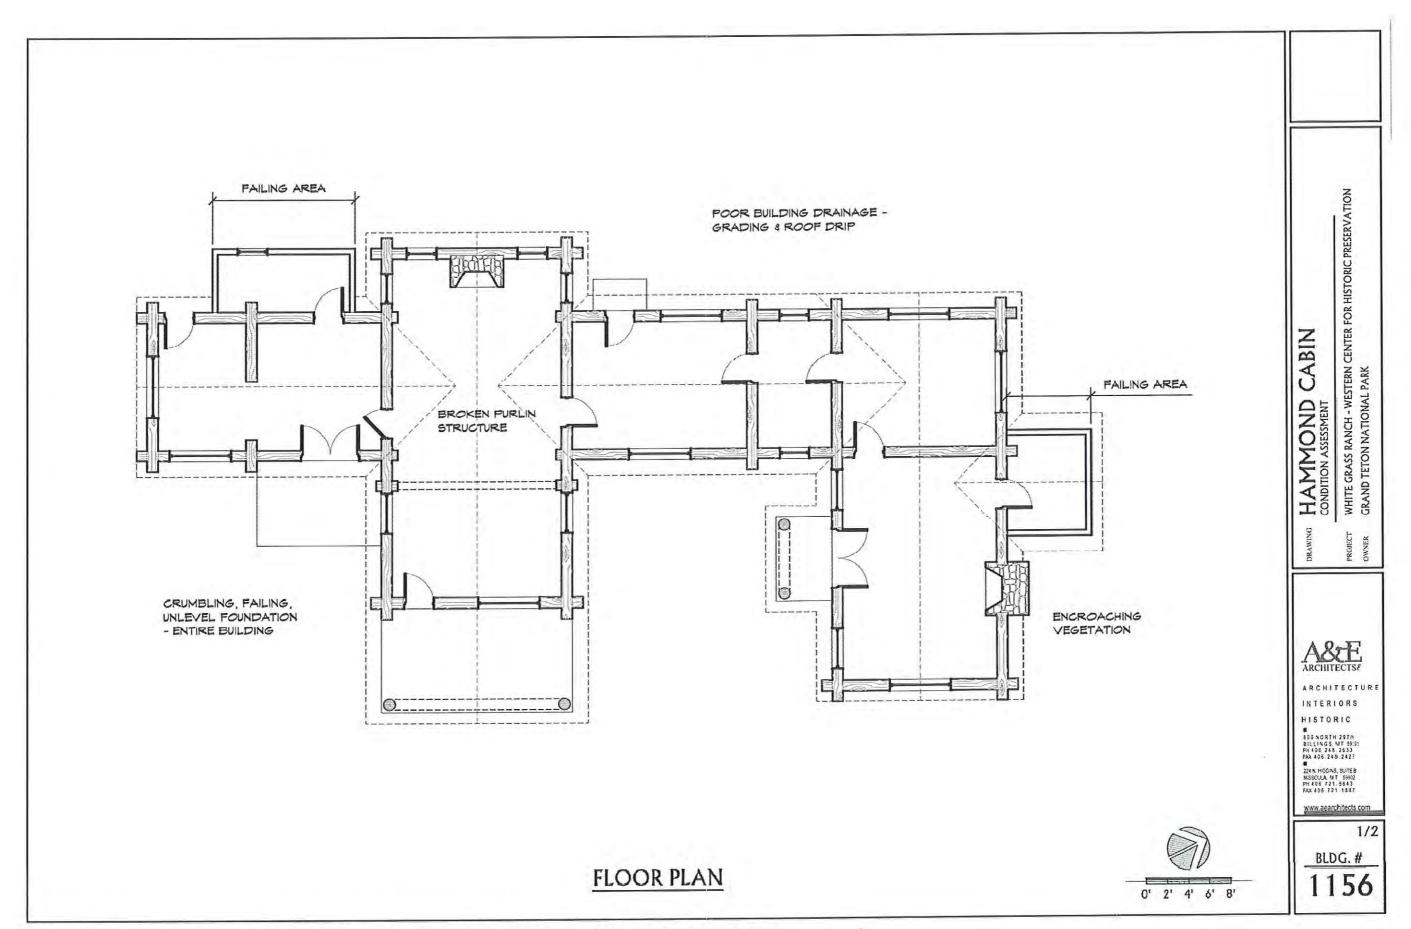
Existing conditions plan for HS-1156, the Hammond Cabin, showing areas of deterioration (A&E: 2006).
